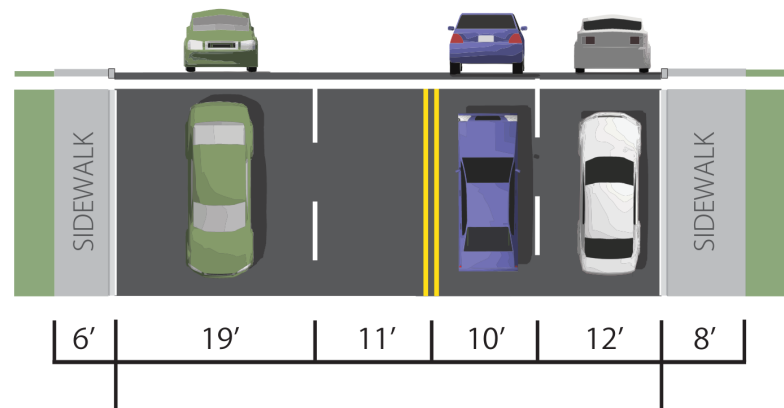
3rd Street Cross-Section | CSAS, Existing
